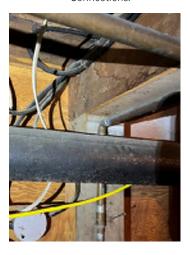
Columns Are Toe-Nailed at the Top to the Beam. No positive connection at the base of the column to the concrete exists.
